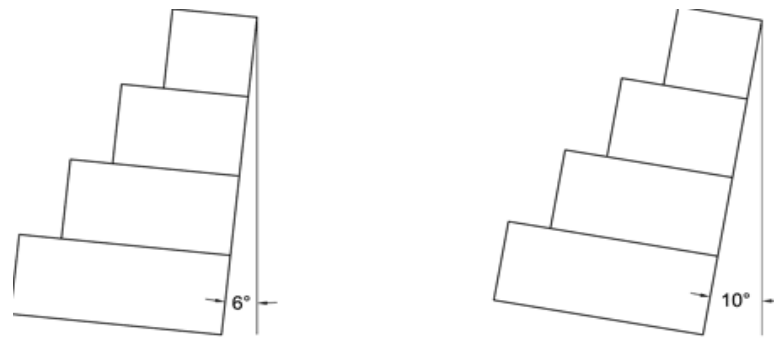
Gabion wall is battered 6 to 10 Degree
